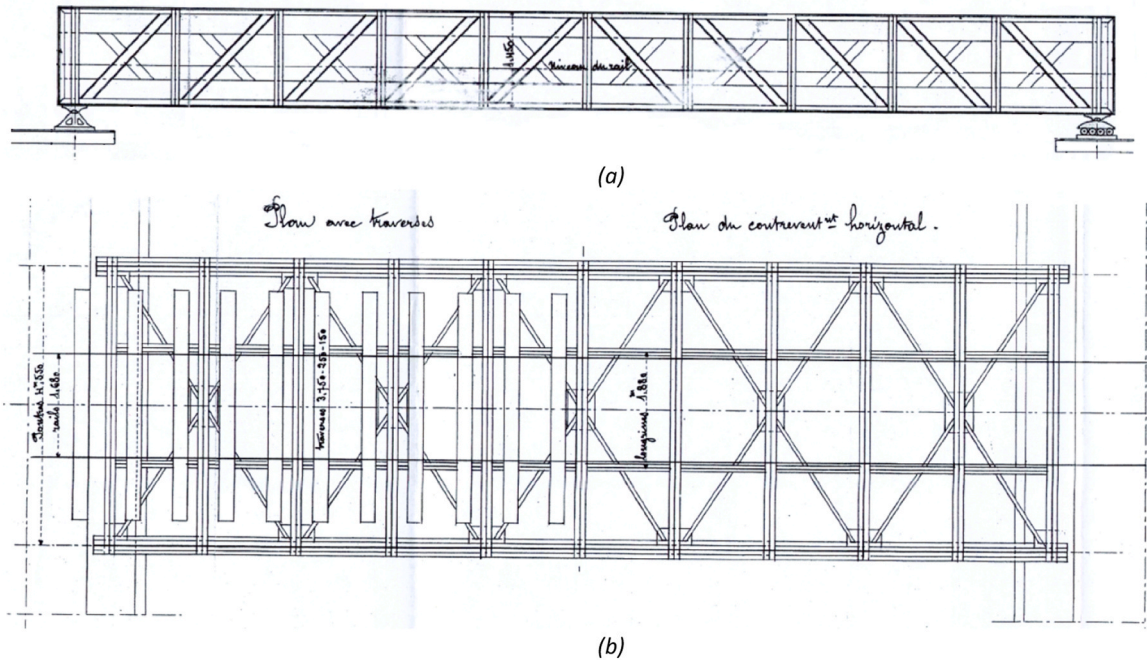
Original drawings for the bridge from Le Creusot Company, EFE [96] (a): Main truss girder (b): Bridge transversal bracing system.
